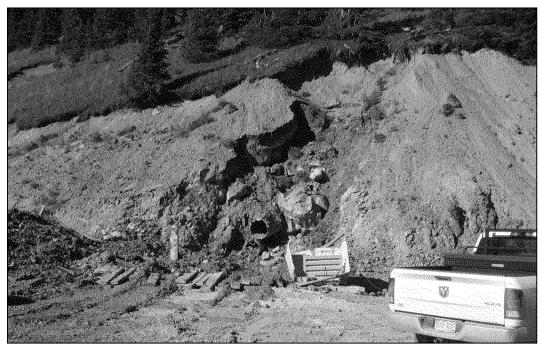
Photograph showing excavation of the Gold King Mine New Adit portal on September 11, 2014. The metal grating and portions of the upper corrugated HDPE pipe and the lower solid-wall drain pipe have been removed (photograph from EPA project files).
